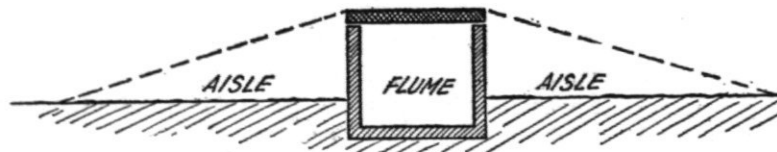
Diagrammatic section of a flume covered by a concrete slab and with concrete ramps to allow a tractor to pass over it.
